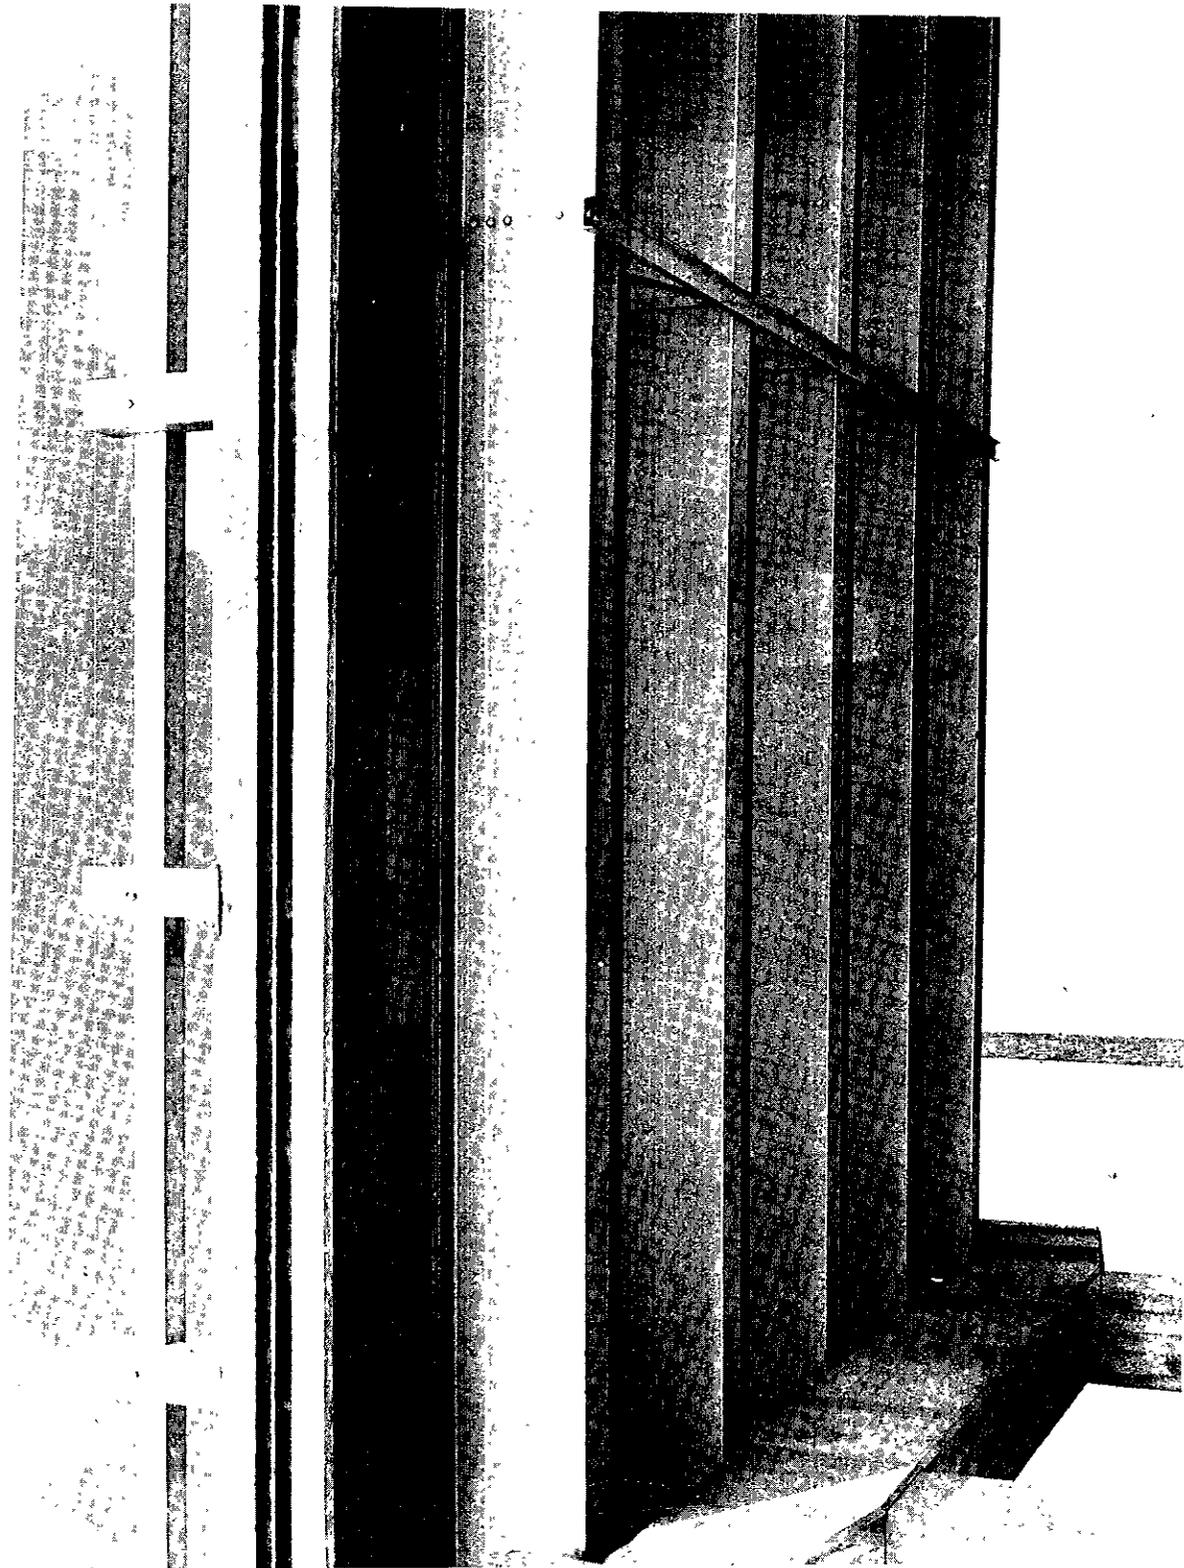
Leffingwell Creek Bridge. Span 4, South Section
